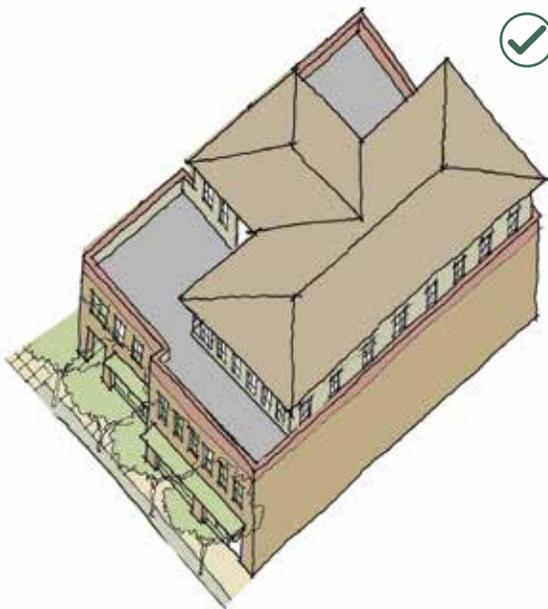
Simple rectangular forms should be dominant on commercial façades.
